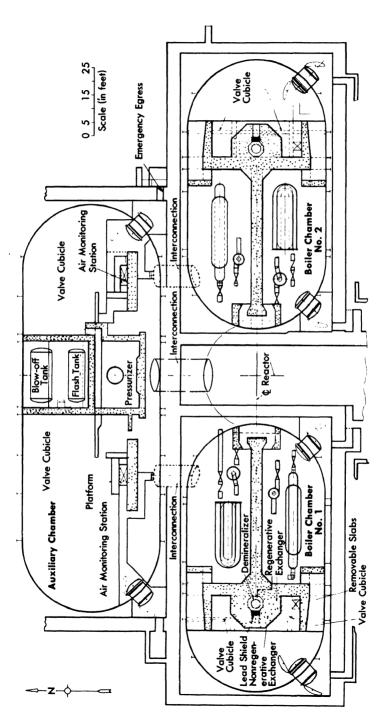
Plan of internal shielding, boiler and auxiliary chambers.
